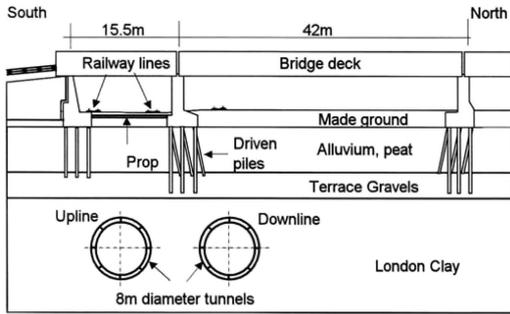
Case history of tunnelling beneath piles on CTRL project in London (Jacobsz et al, 2005).
